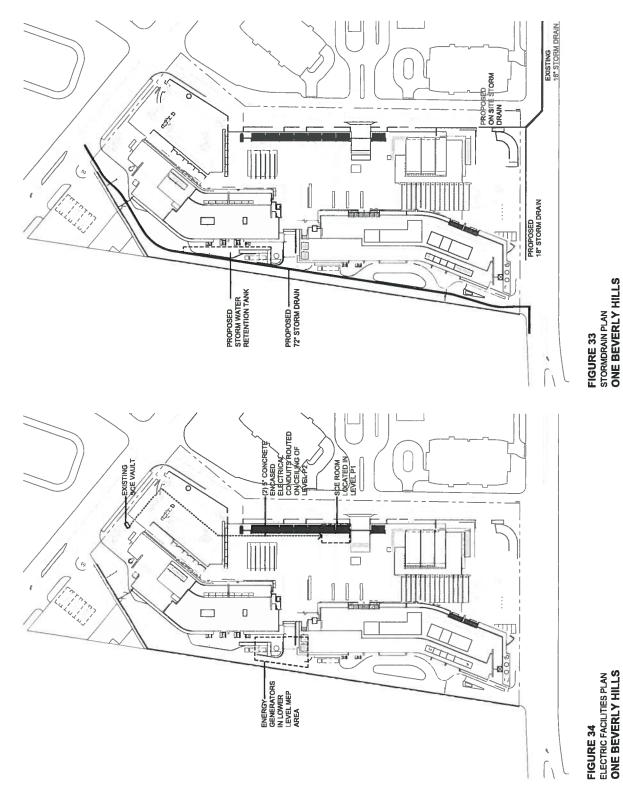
STORMDRAIN PLAN ONE BEVERLY HILLS
